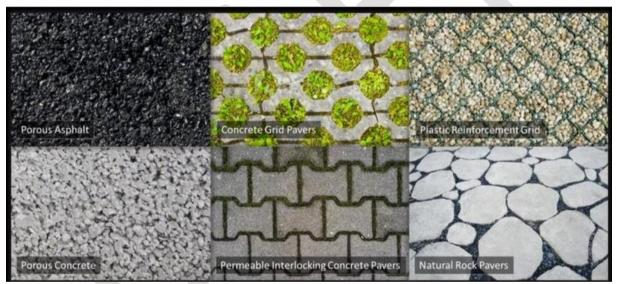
Examples of permeable surface which should be used as an alternative to impermeable paving or road surfaces wherever possible.
